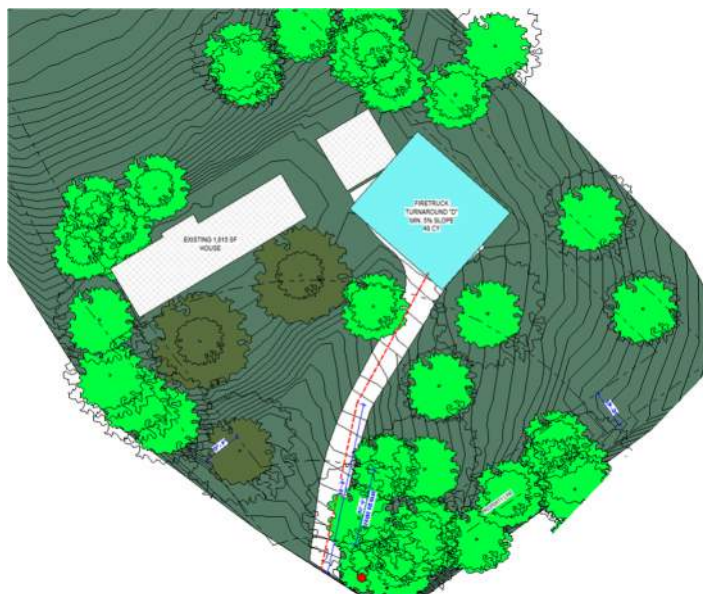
Site plan showing footprint of required fire truck turn-around. Due to the sloped nature of the site only Fire truck turn-around D works at lower pad due to minimum 5% grade requirement. At a minimum the grading for the lower portion for this driveway is 50 CY. This leaves no space for pool, 5,700 SF house with indoor/outdoor space due to hillside abutting existing pad, or lawn, sport court area.
